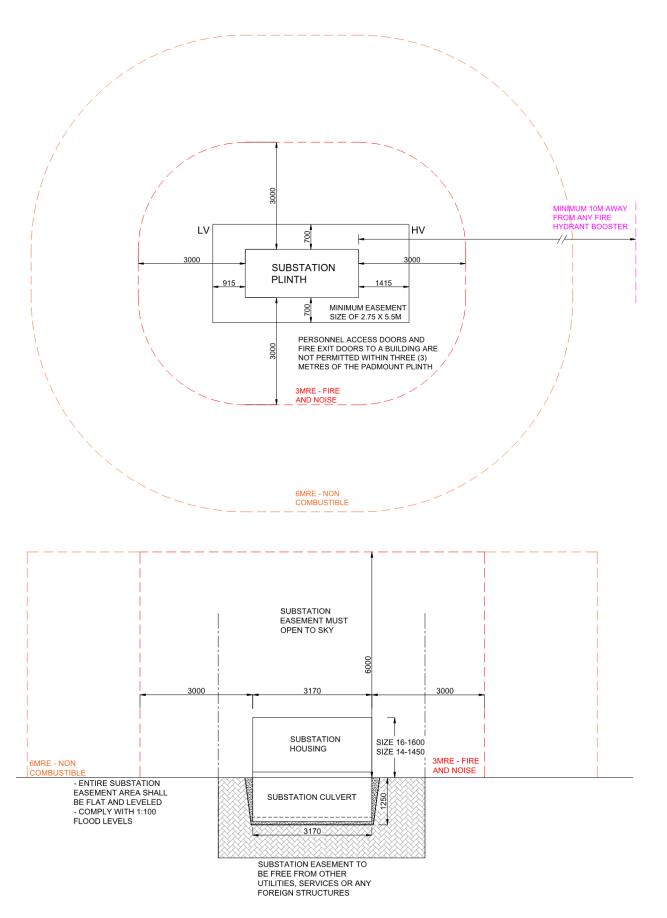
Typical Endeavour Energy Padmount Substation Spatial Details
